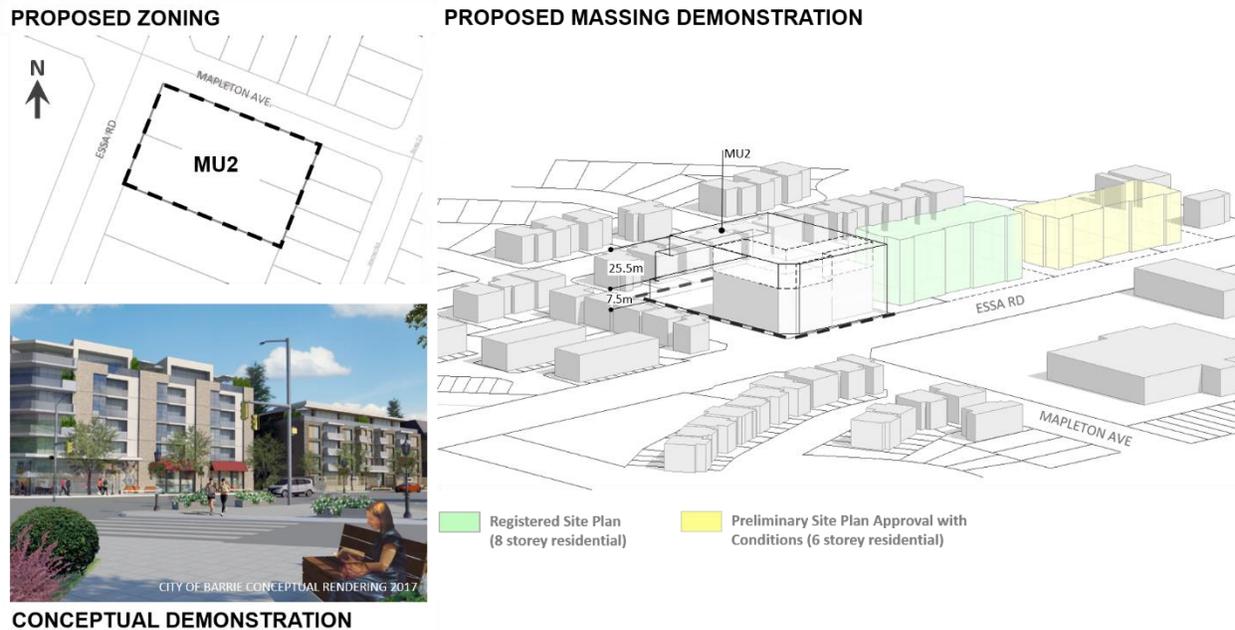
550 and 552 Essa Road - Proposed Mixed Use Corridor (MU2)(SP-XXX) Conditions
